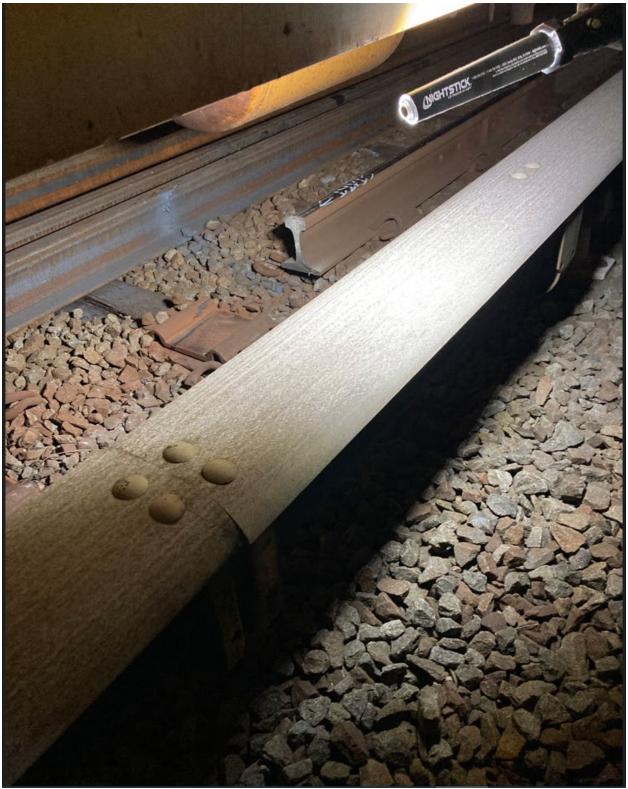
Cut running rail at the derailment point and adjacent cut rail sections.
